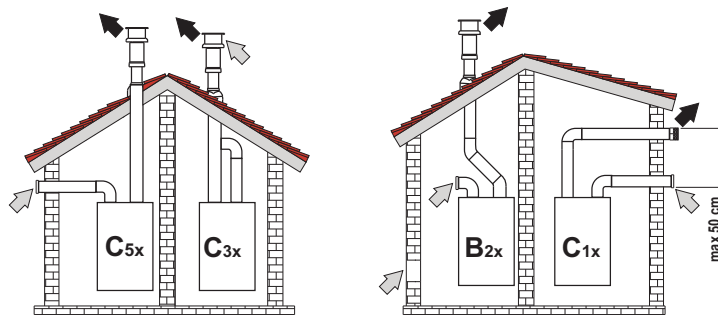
Examples of connection with separate pipes (⇐ = Air / ⇨ = Fumes)
